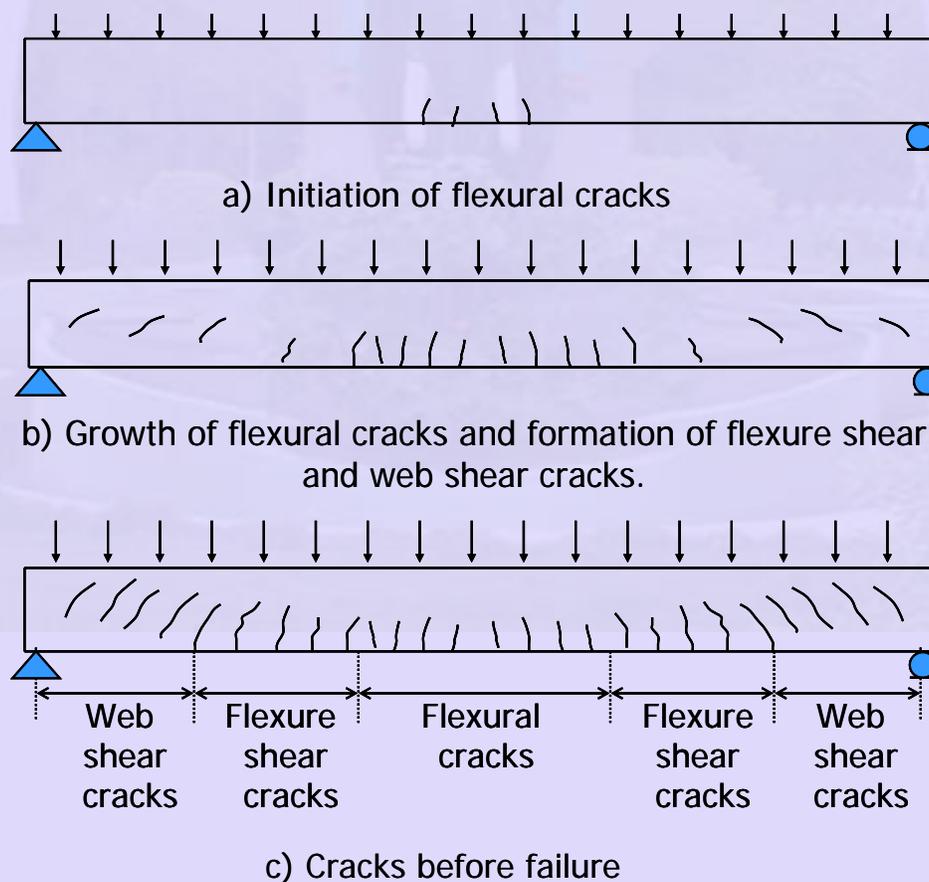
Formation of cracks in a reinforced concrete beam
